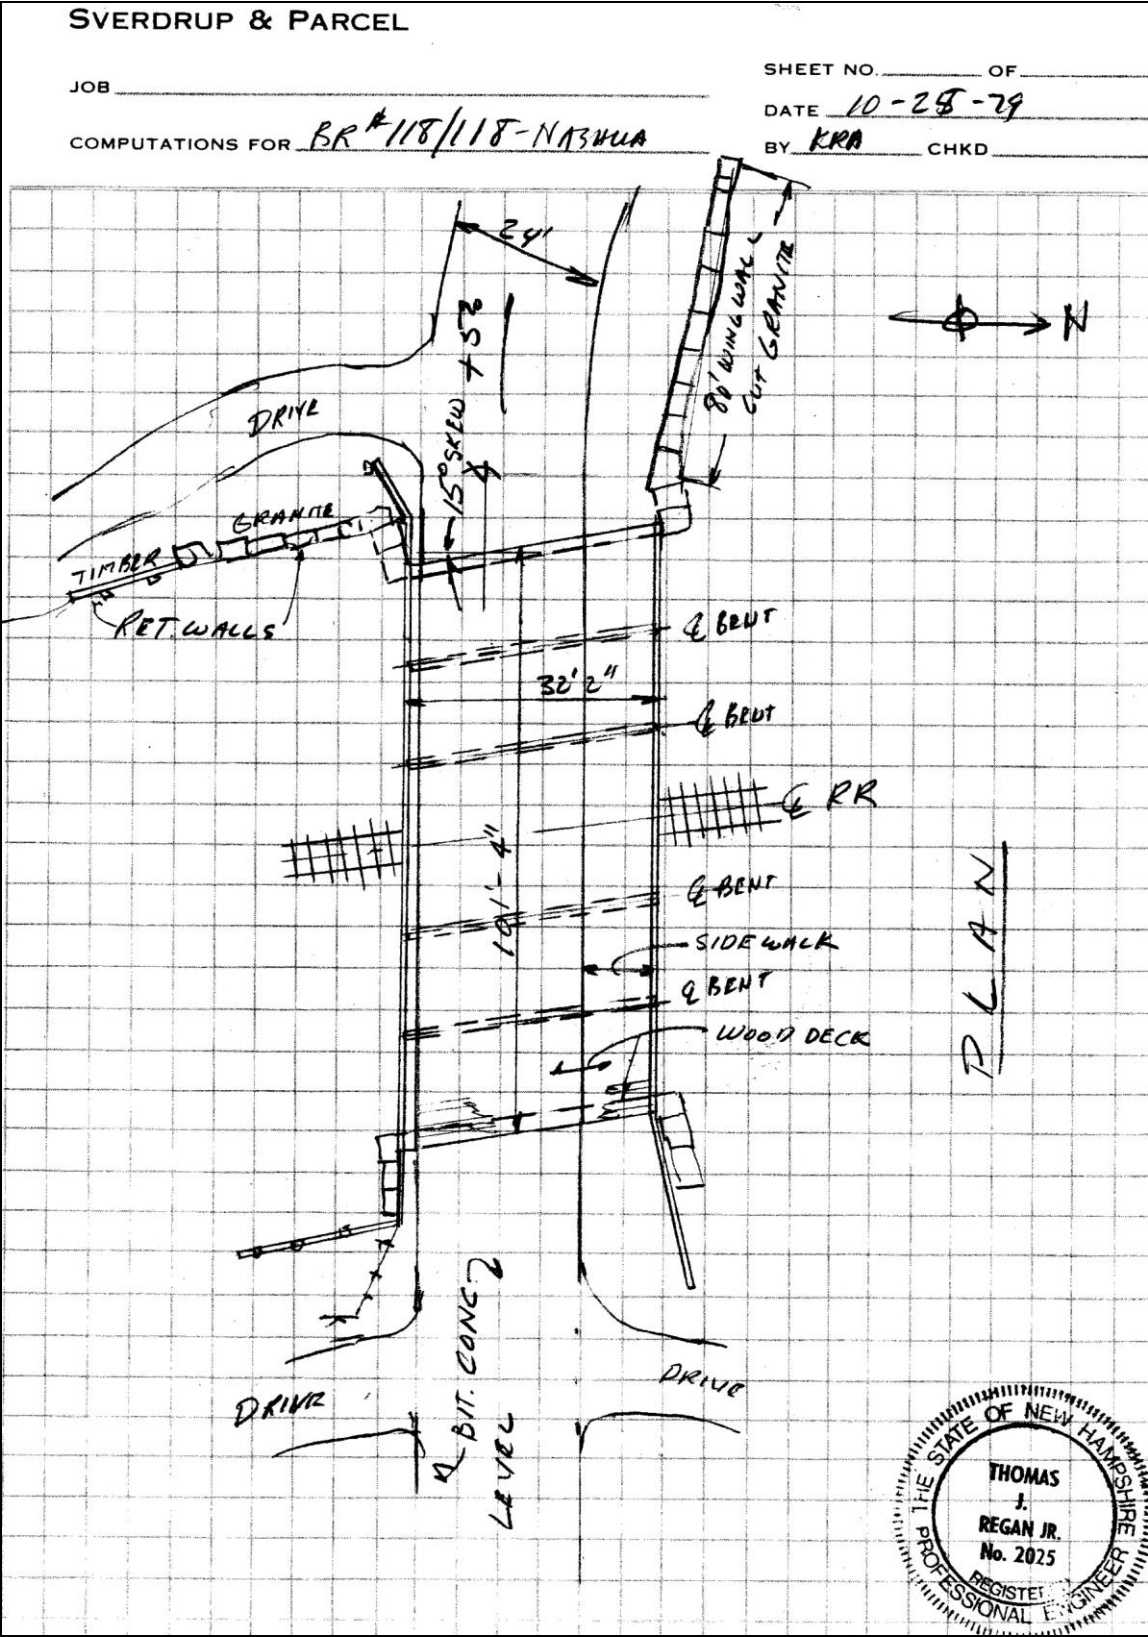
Fairmount St. Bridge Engineering Inspection Sketch by Thomas Regan, Jr. CE, Sverdrup & Parcel Engineers, October 1979 (NHDOT Bridge Inspection File).
